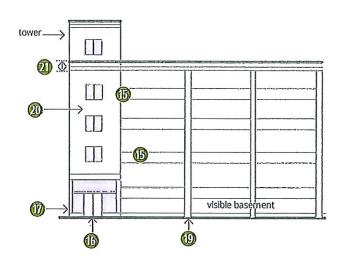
C. Parking Structure: Height and Uses Requirements
